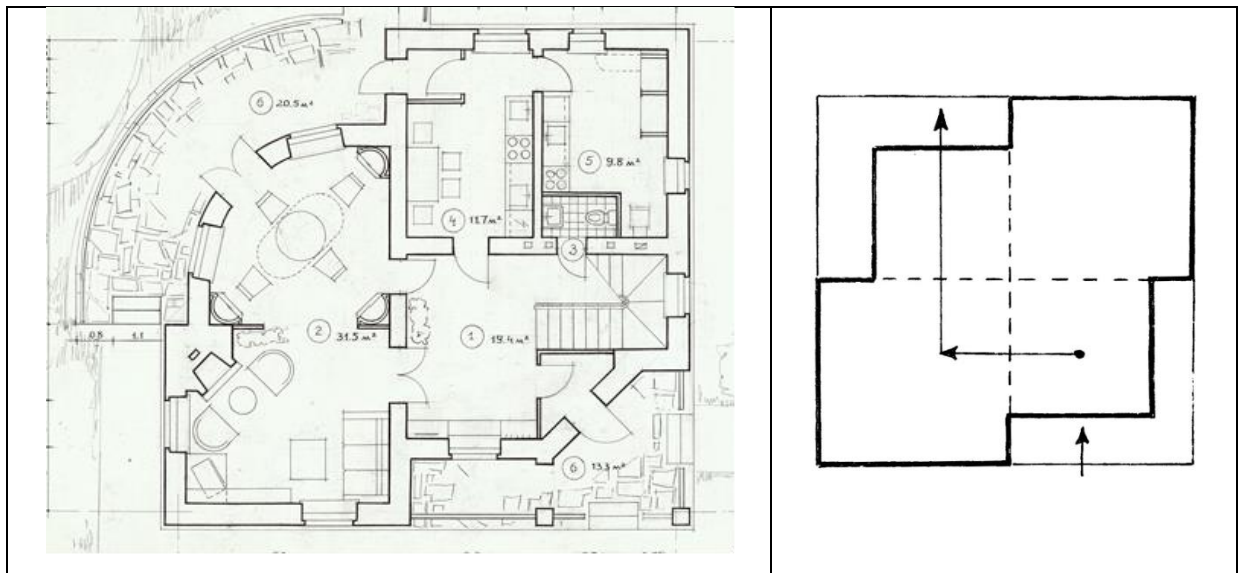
Dwelling house for the family of the artist-restorer, Kyiv, author's project
